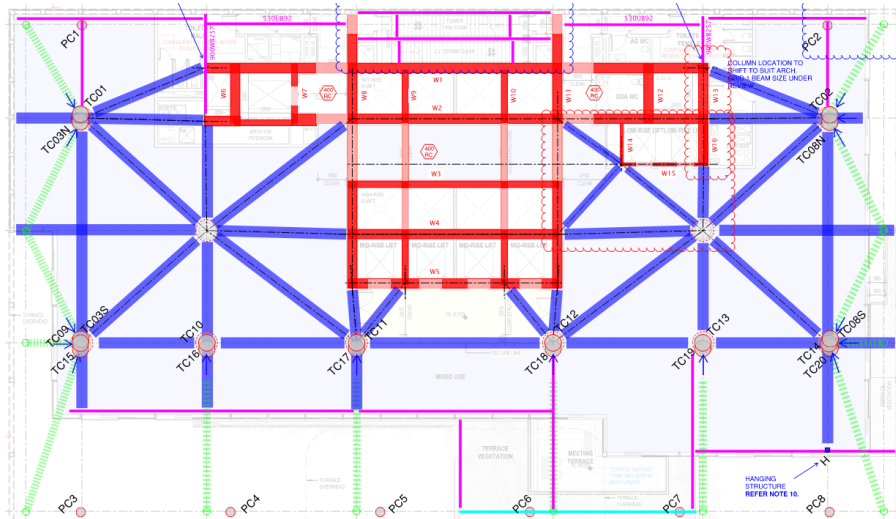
Plan View of the Level 6 Diaphragm Structure
